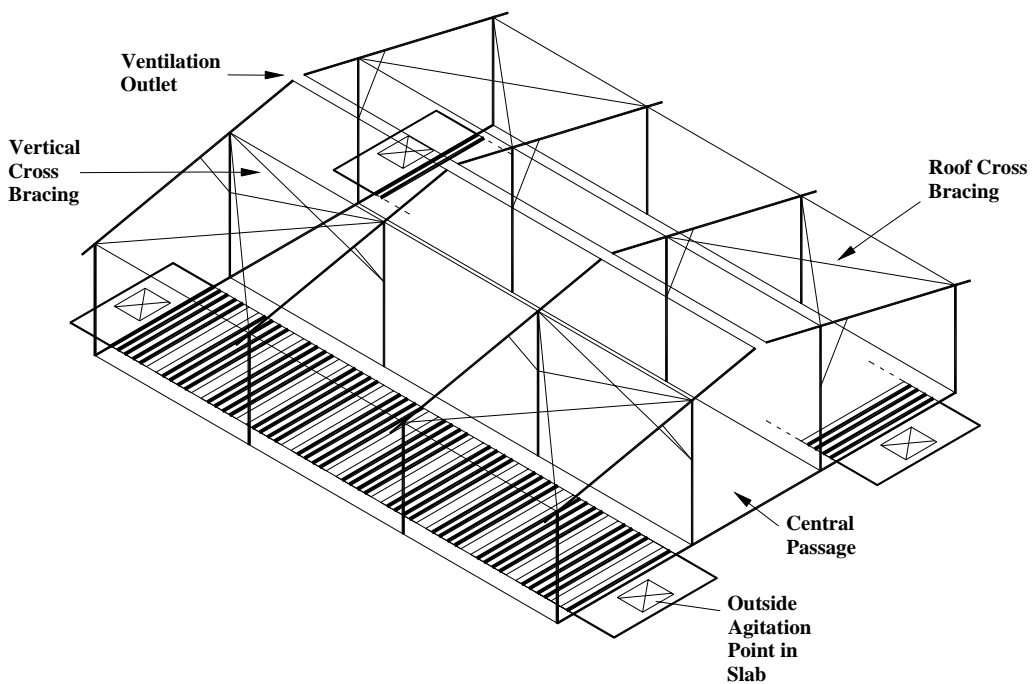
Double-sided simple steel frame house (3 bay/4.8m per bay/14.4m/tank-16.8m)
